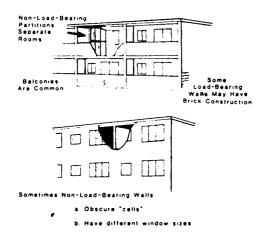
Mass Construction -Box-Wall Type, Apartment House.
